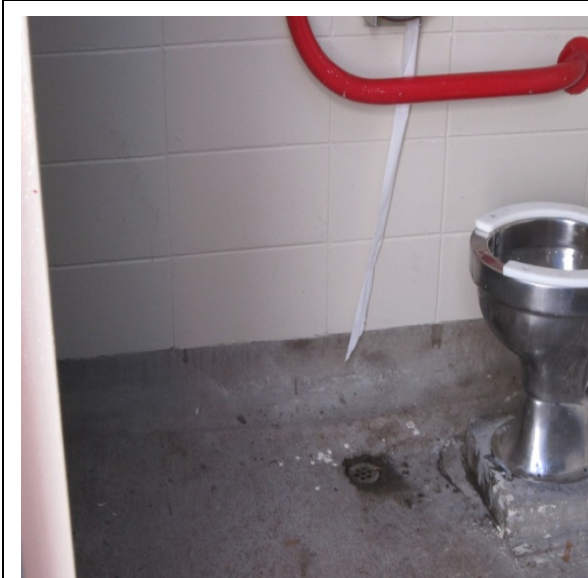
Concrete ground slab with concrete strip footings directly under the masonry wall.
